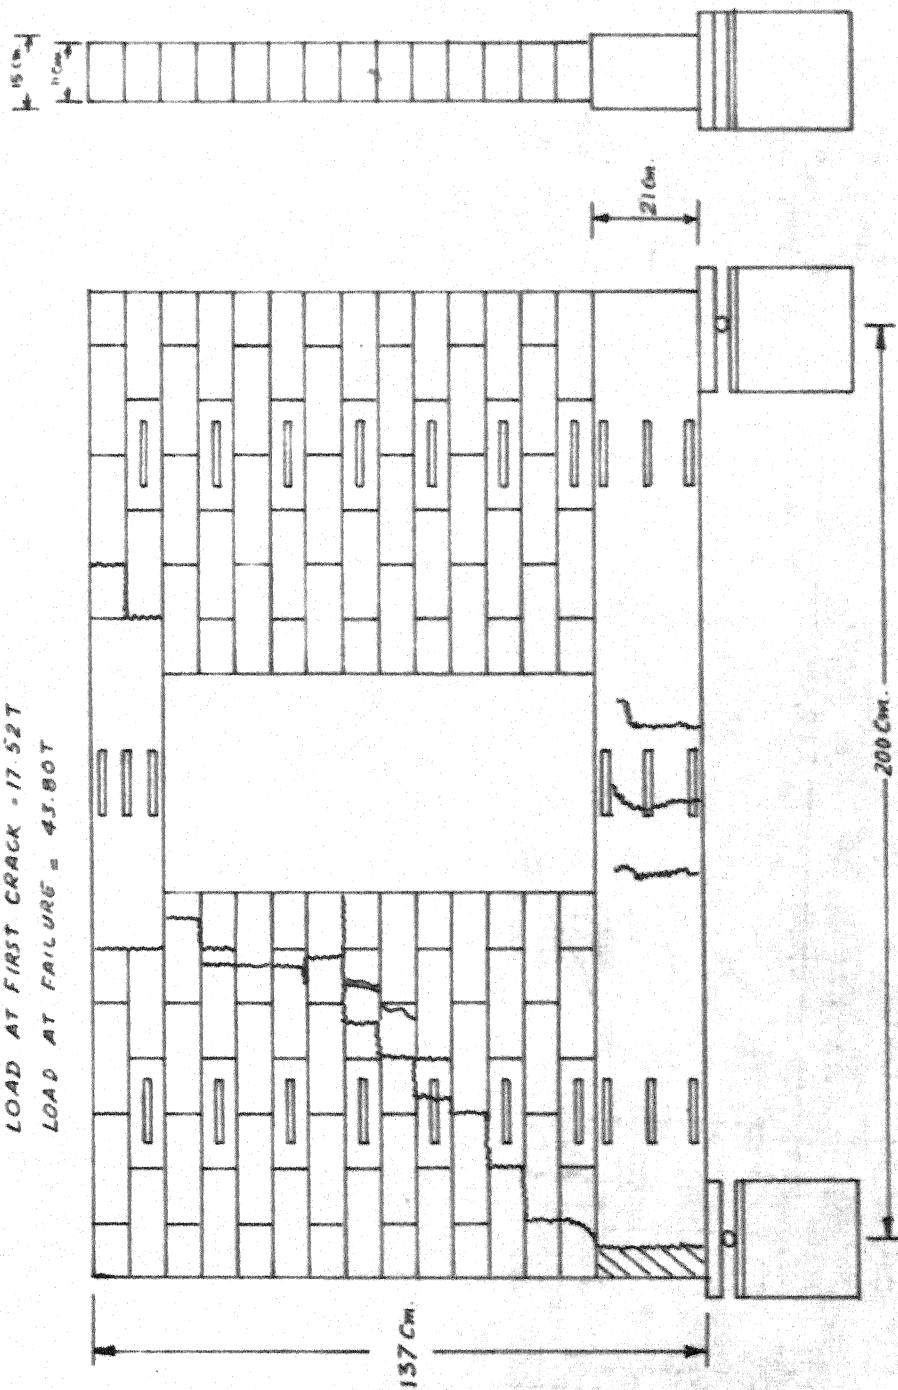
CRACK PATTERN AT FAILURE - BEAM C.2
